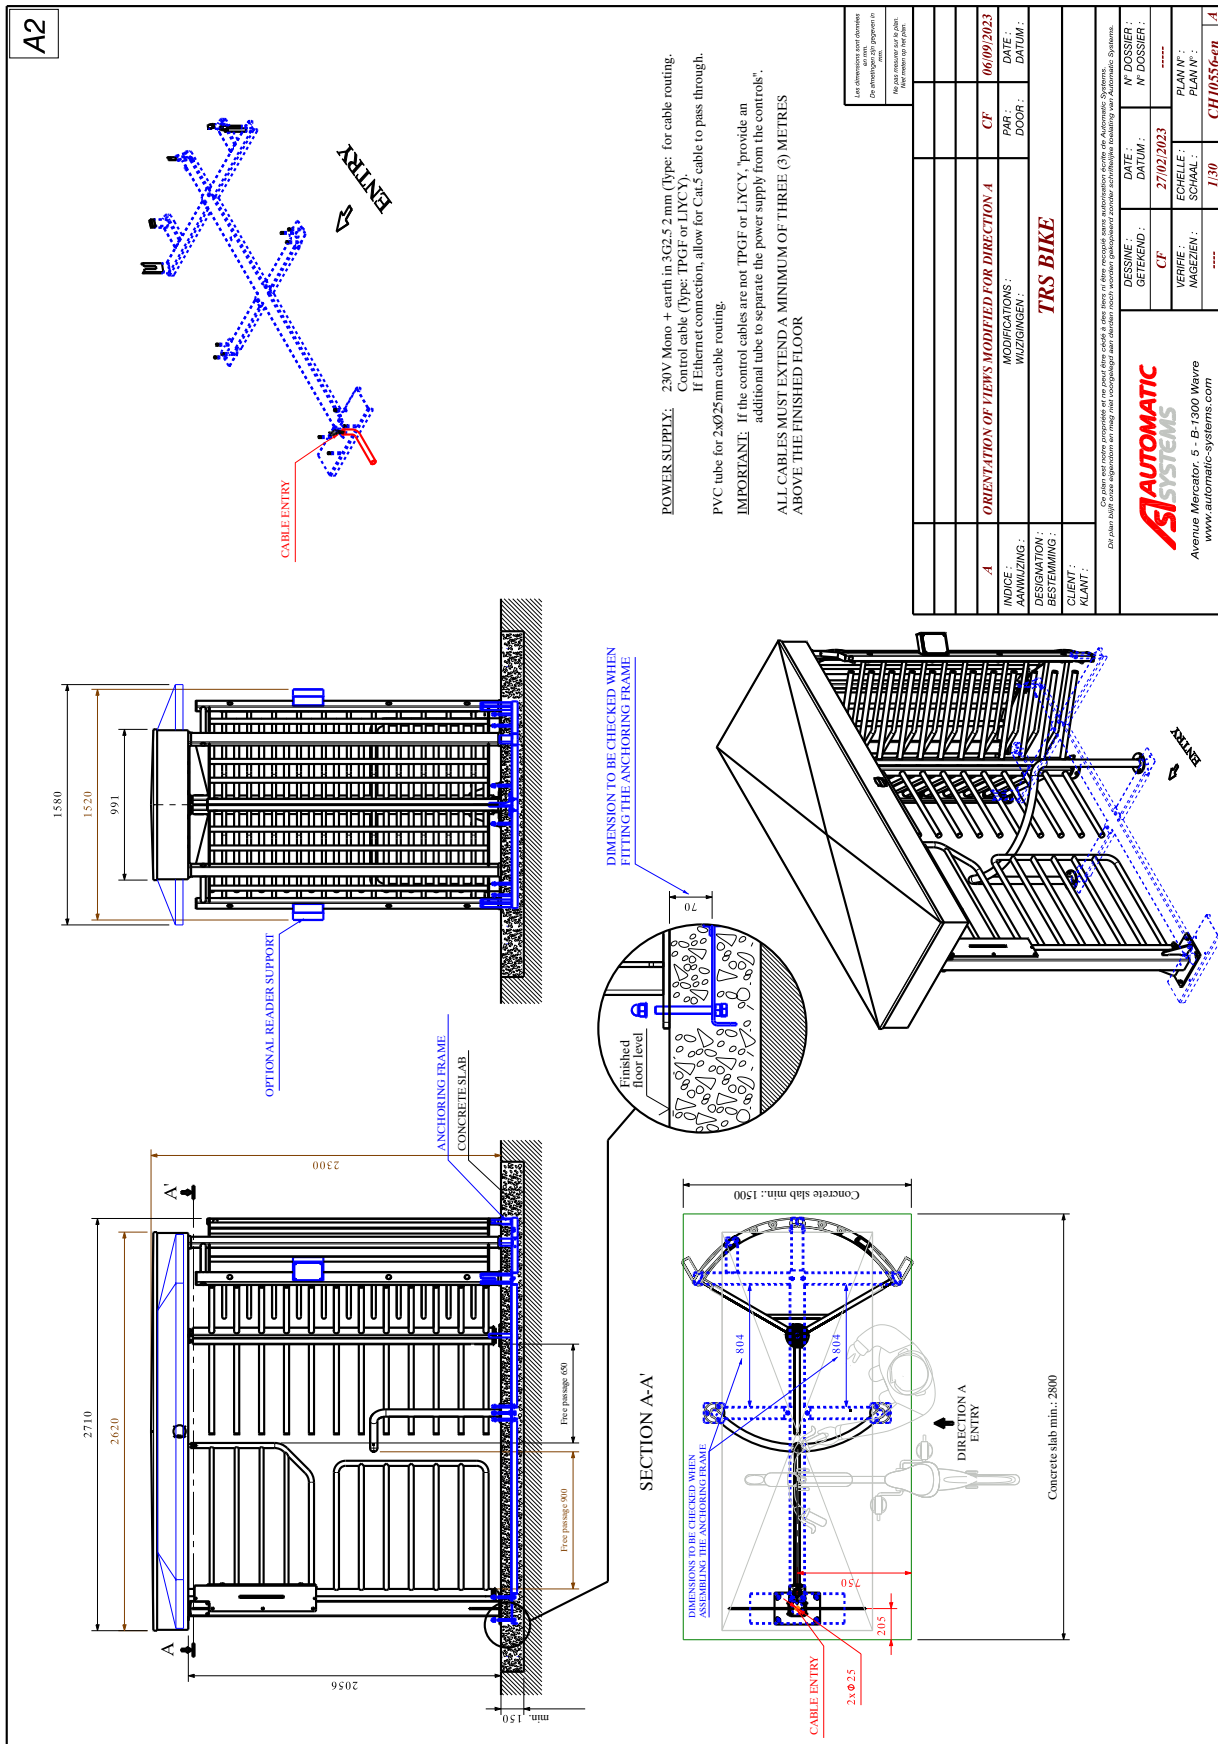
TRS BIKE Installation plan - Fixing to an anchoring frame
